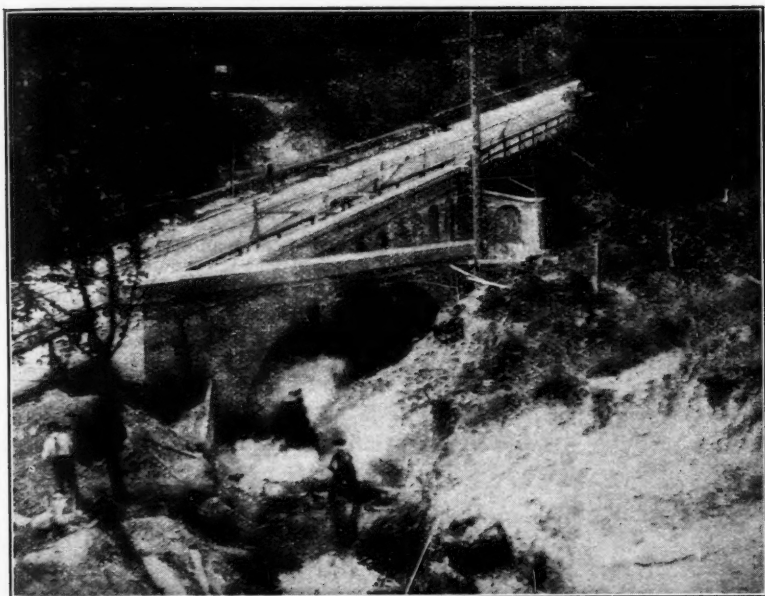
VIEW LOOKING DOWN, DURING CONSTRUCTION, OF SKEW ARCH IN LESCHI PARK, SEATTLE, WASH.
